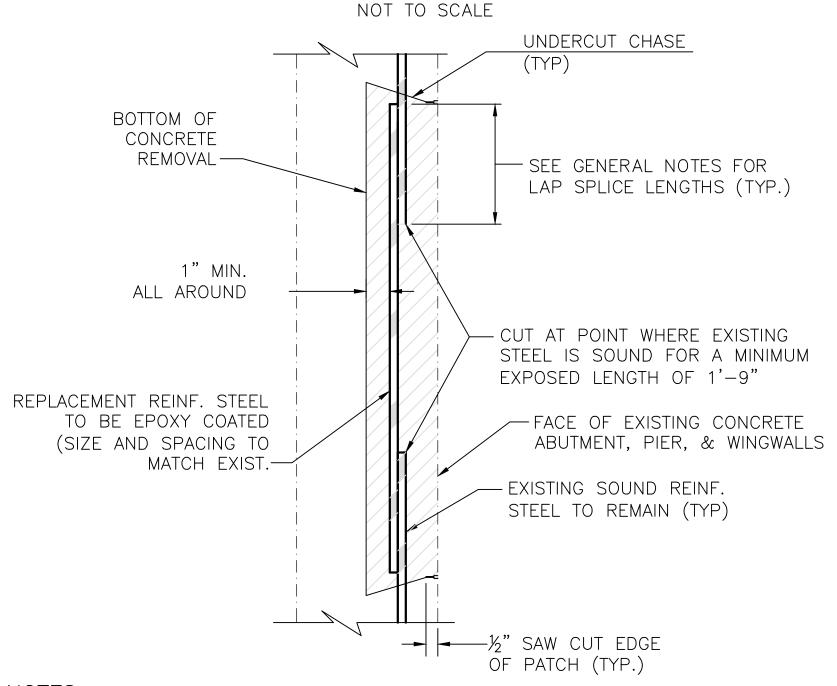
PARTIAL DEPTH SUBSTRUCTURE REPAIR
